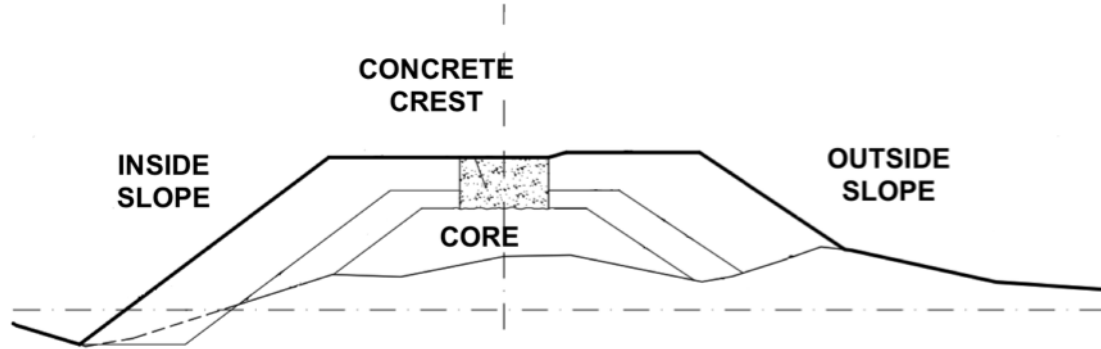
Generic cross-section of the Angeiras breakwater, adapted from CONSULMAR (2010b)
